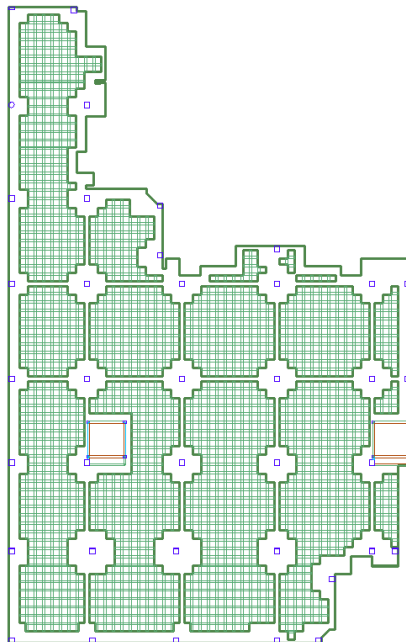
VIEW OF POST-TENSIONED WAFFLE SLAB CONSTRUCTION
